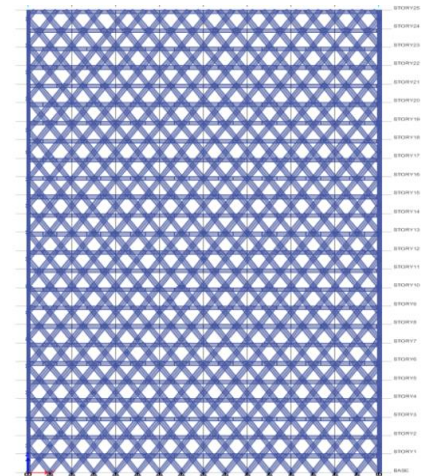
Elevation of Tubular Diagrid Structure with 60° Angle
